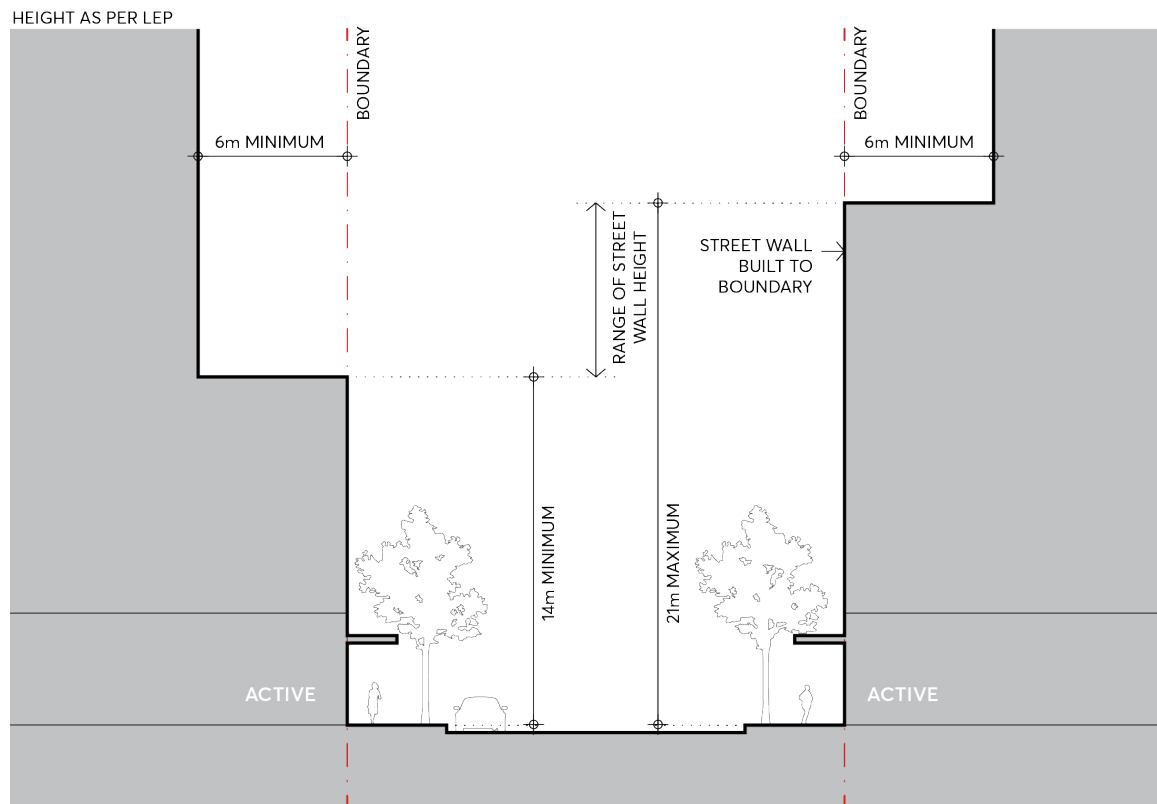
City East Block Phillip Street (Section B)
